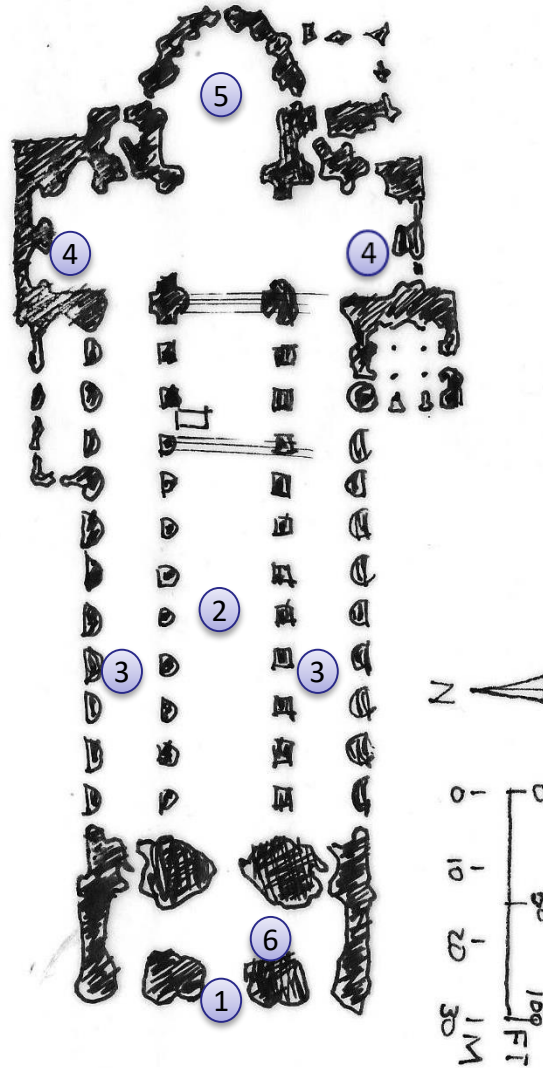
Sketch Floor Plan of Speyer Cathedral (Author 2021).
